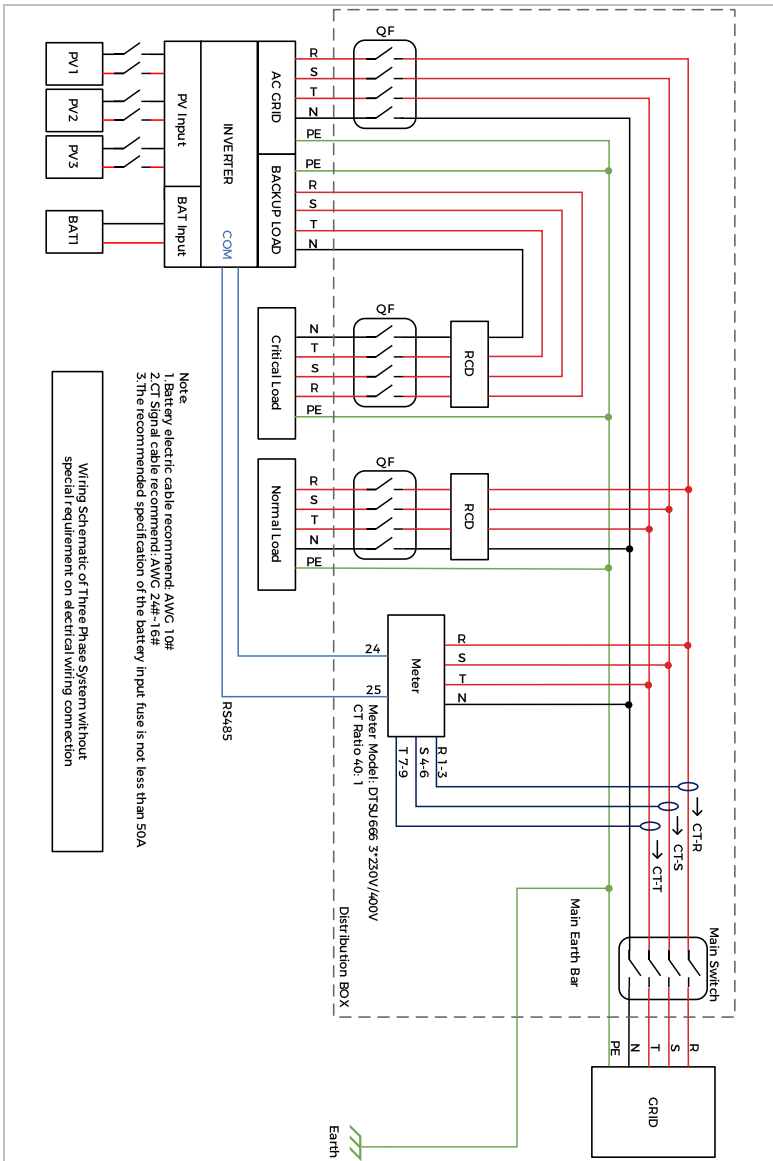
Electrical connections (Plan B: Meter + CTs)
